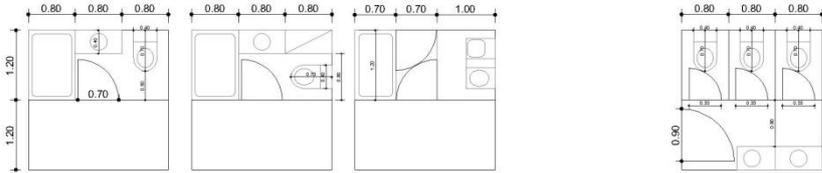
Sanitation facilities layout study for a 2,4m³ module
